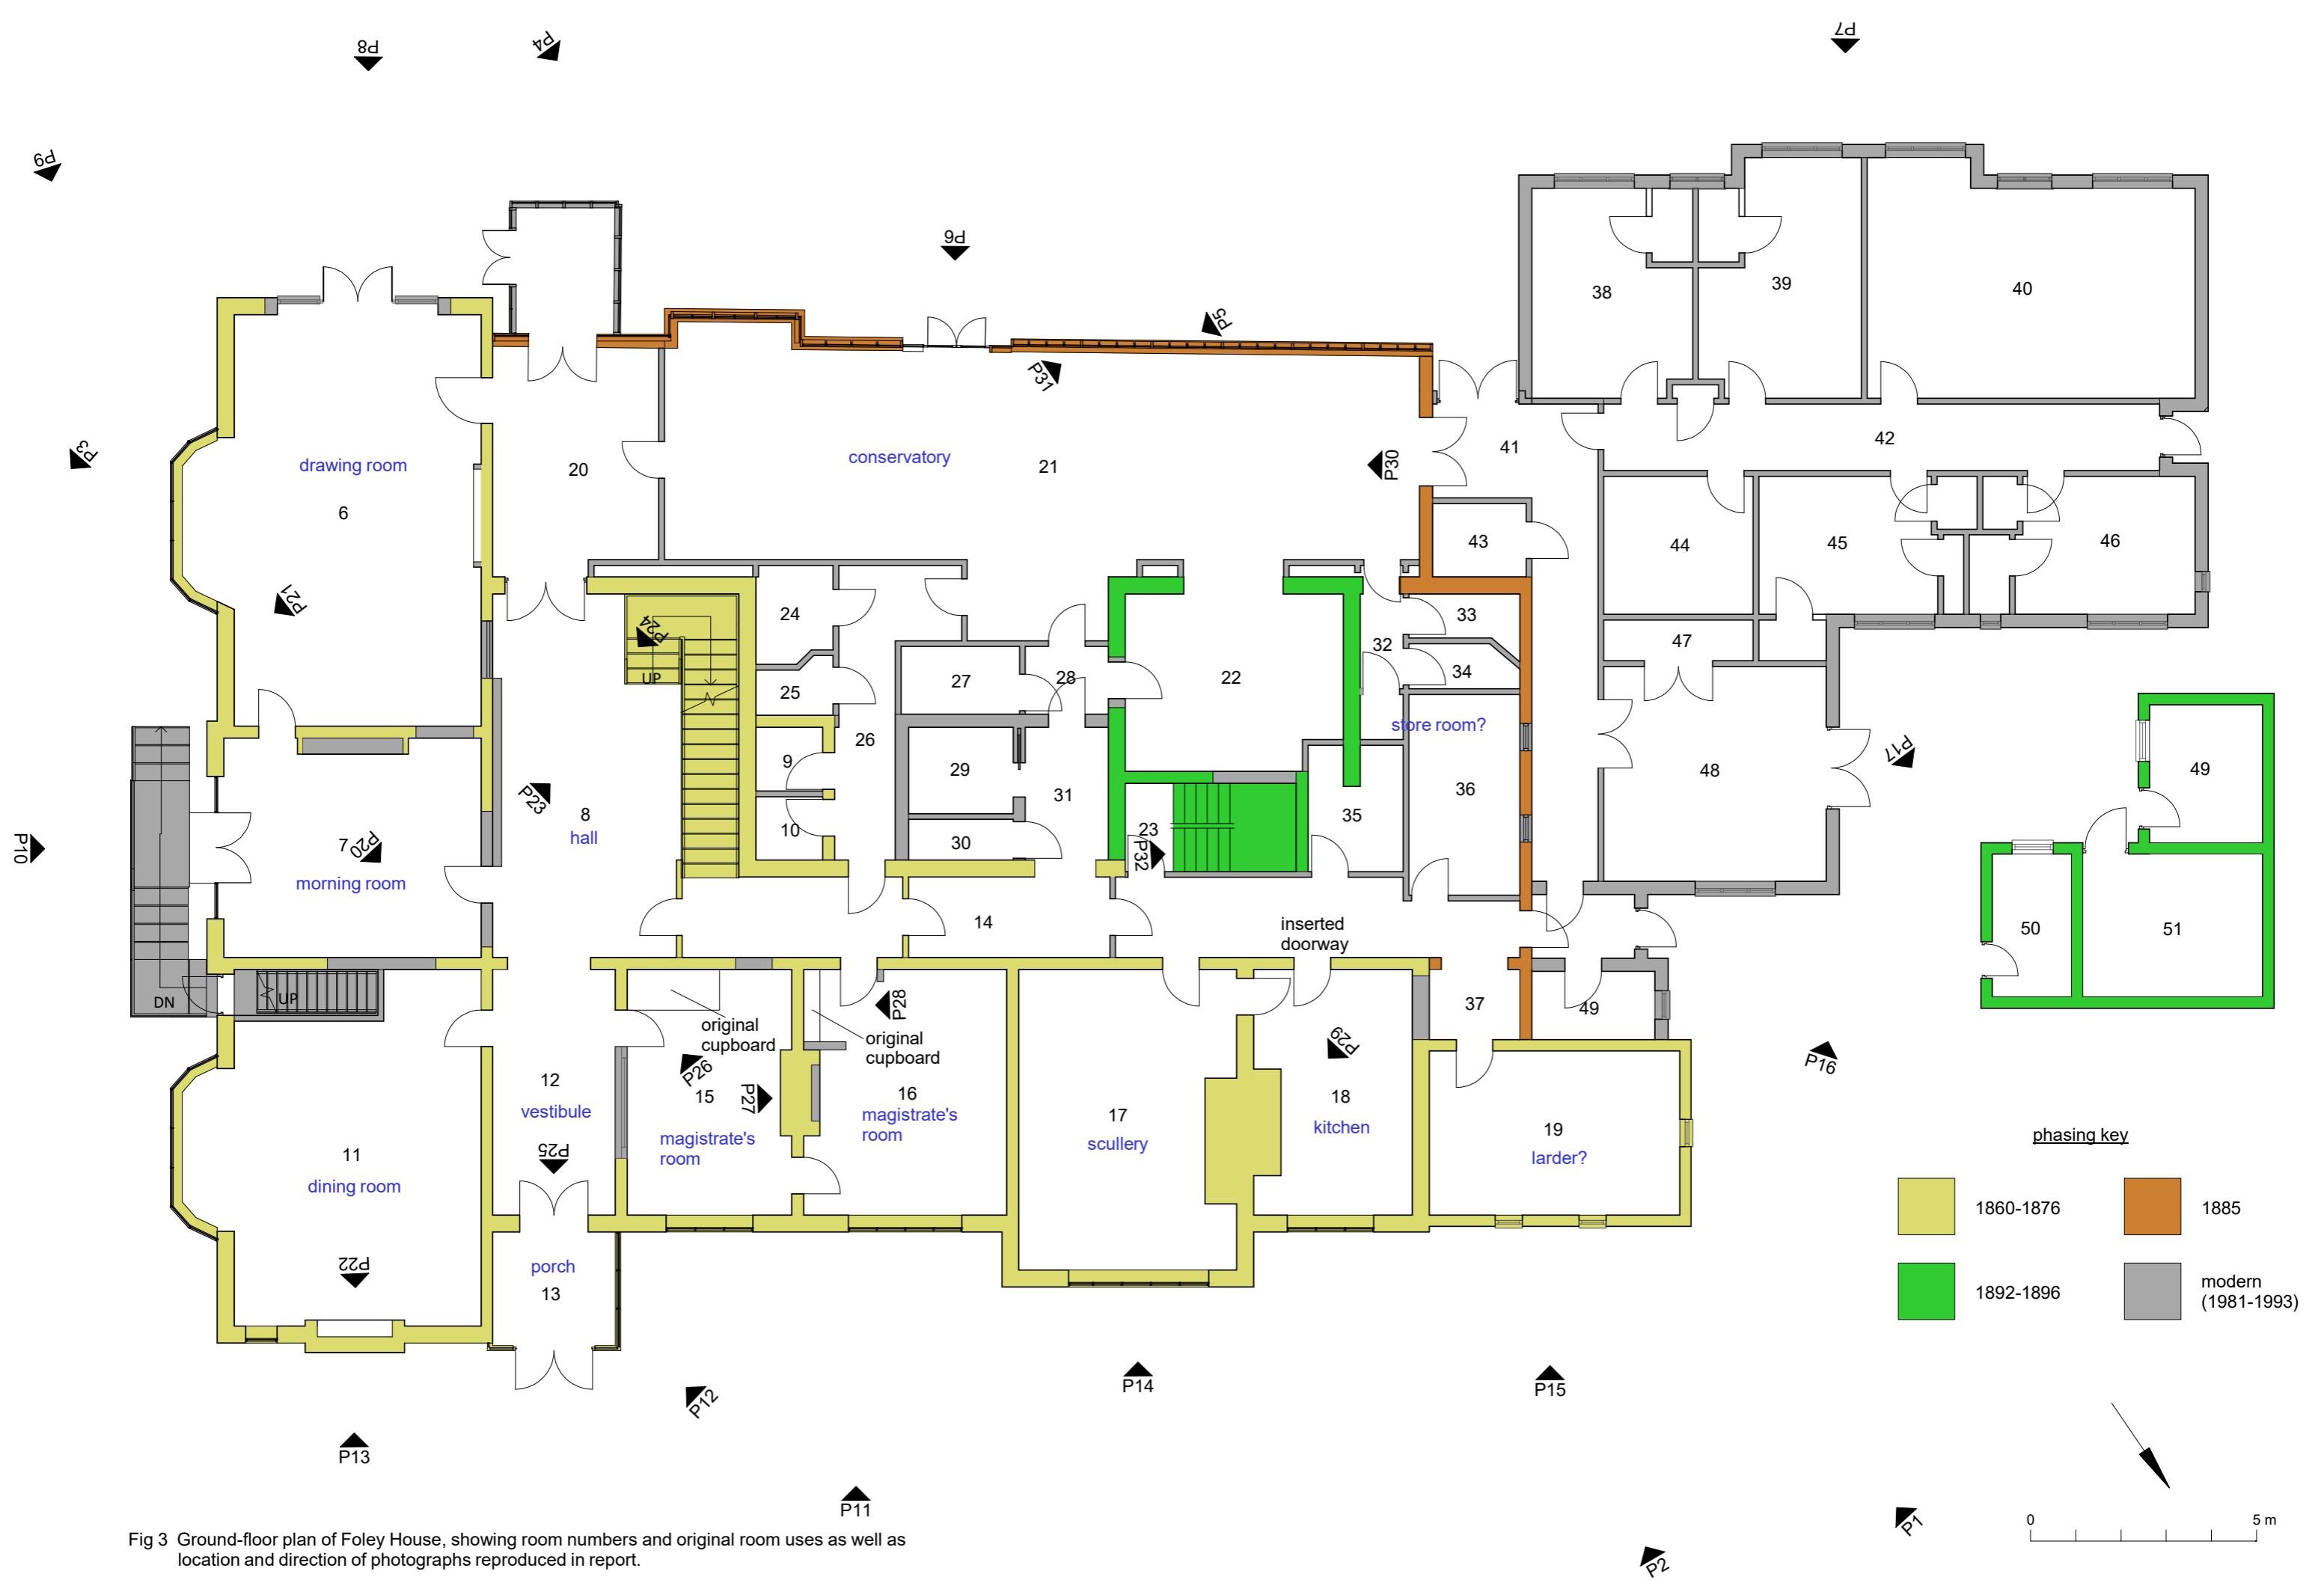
Ground-floor plan of Foley House, showing room numbers and original room uses as well as location and direction of photographs reproduced in report.
